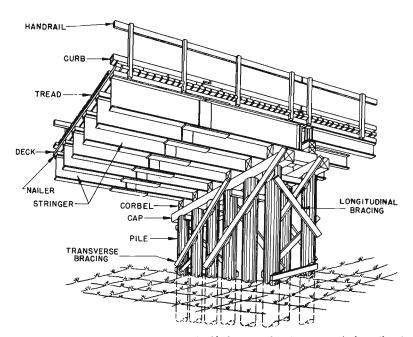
Highway bridge, class 50, double-lane, steel stringers on timber pile pier.
